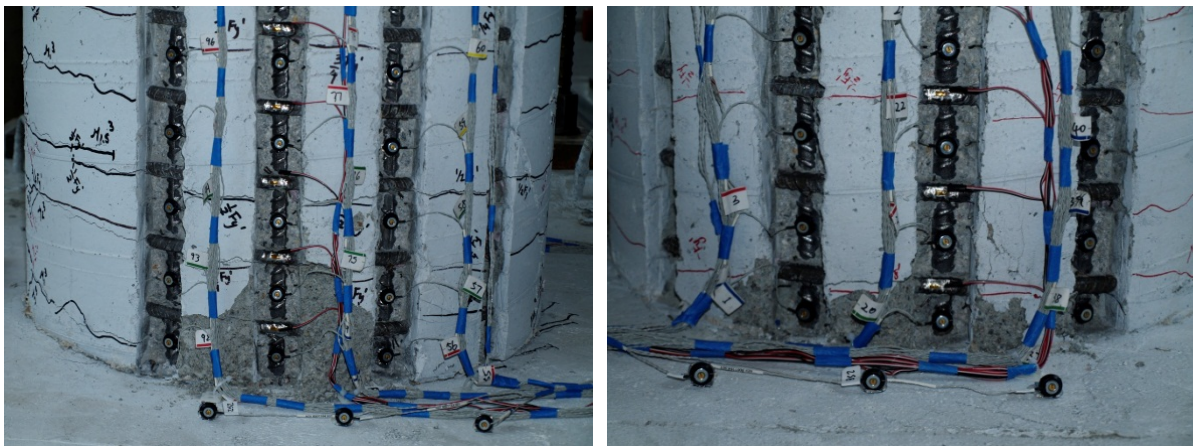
Test 13 – Concrete Cover Crushing at the End of Ductility Two (Left - North) and (Right - South)
